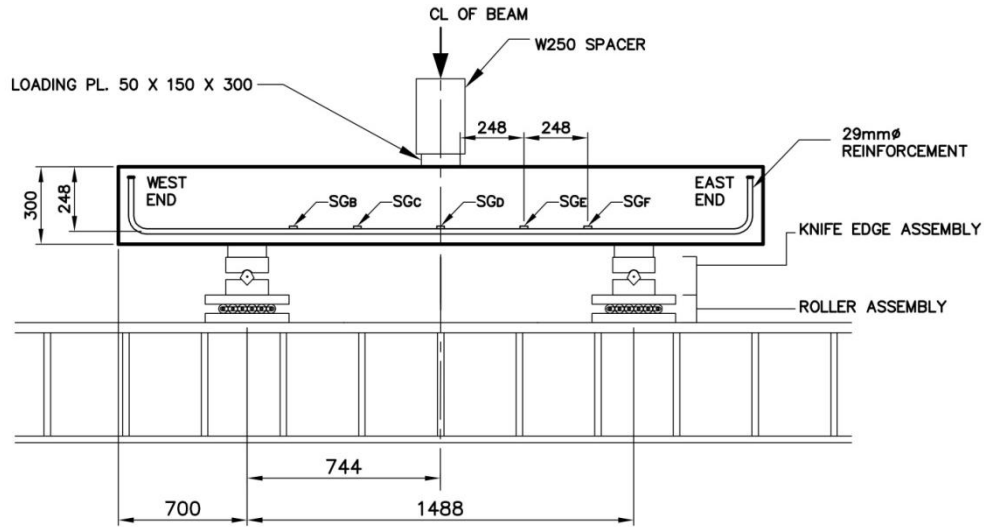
Specimen S300-B1 Test Setup and Configuration
